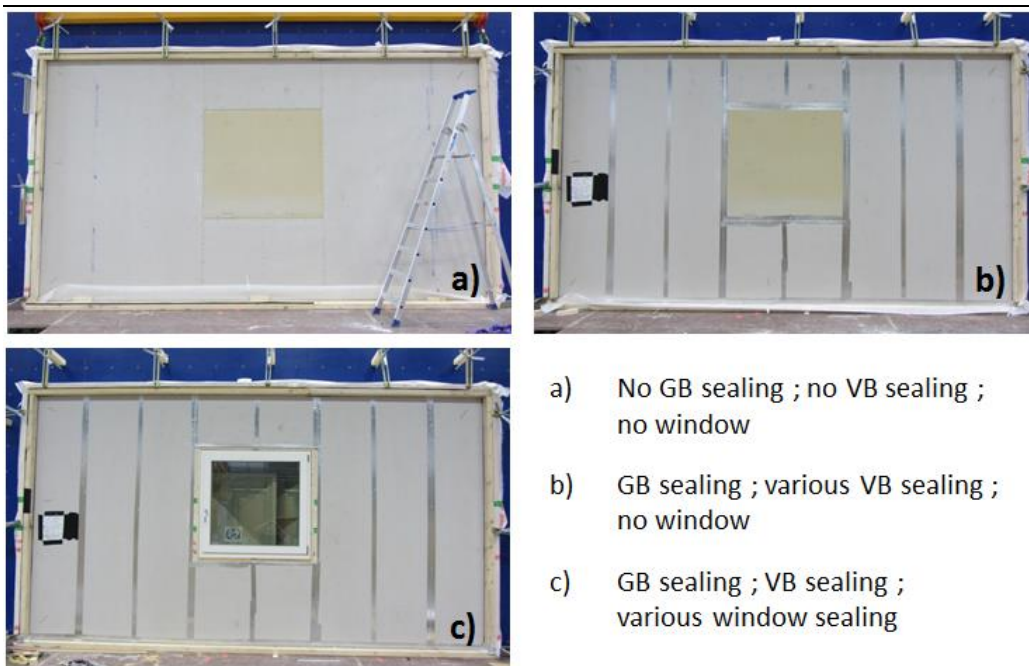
Steps of the timber frame wall assembly air permeability tests on the AEV bench
